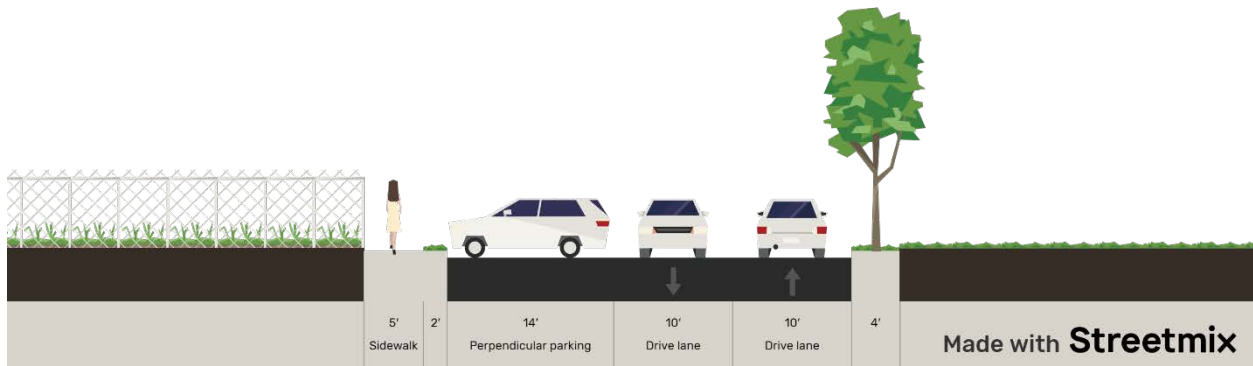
Street cross-section of Alamo Street looking east. The park is to the right of the street which has two drive lanes, a small parking area, and the neighborhood residences on either side of the street. Diagram created in Streetmix by EC, 2022.
